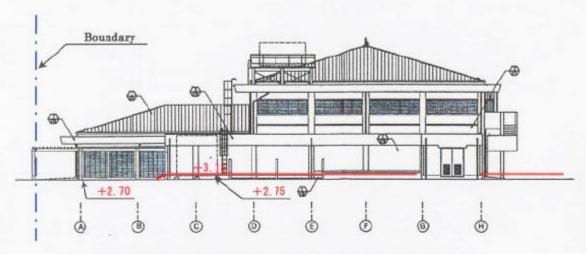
(1) Concept of Ground Floor Elevation
